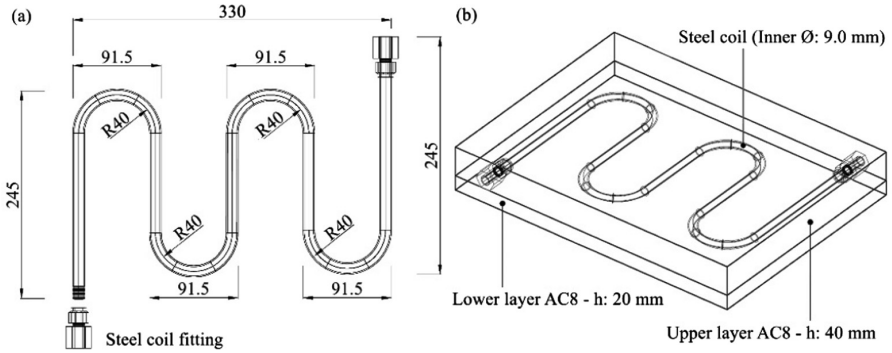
Steel coil scheme (a) and positioning on asphalt concrete (b)
